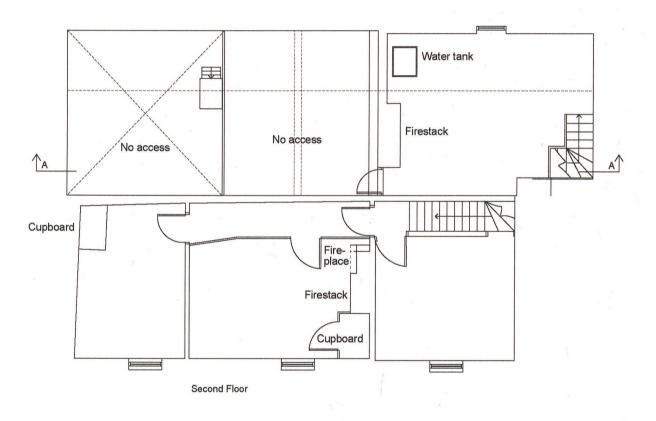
Second floor plan. Based on drawings supplied by Kirsop Chartered Building Surveyors
